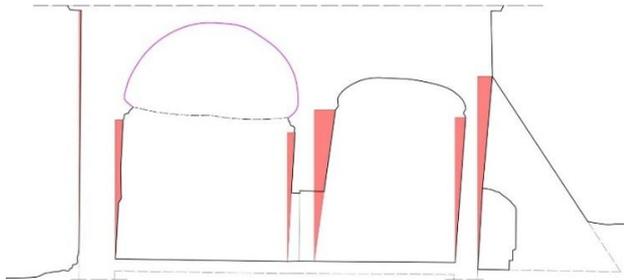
Church of Vico (P32): section highlighting significant structural damage
